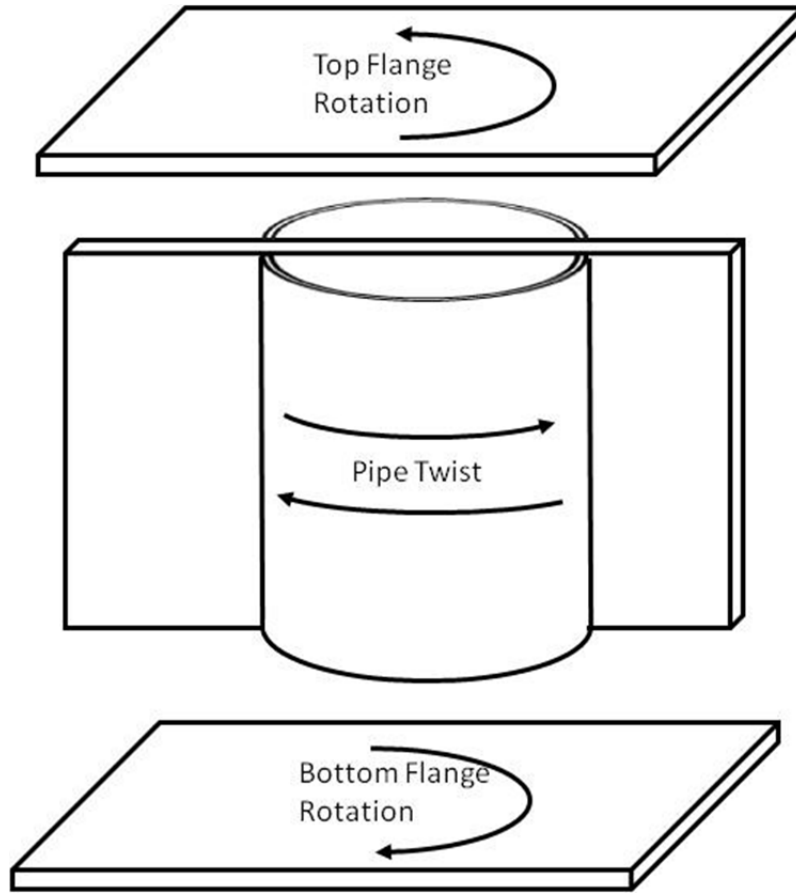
Pipe stiffener twist due to girder flange end rotation
